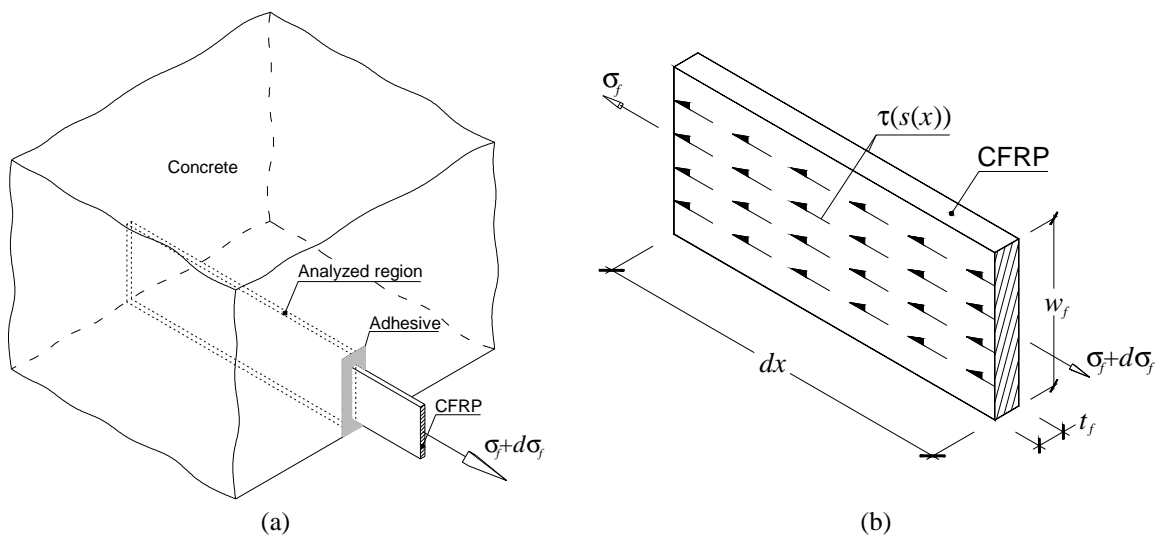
(a) Laminate strip bonded to concrete; (b) Equilibrium of the CFRP laminate strip.
